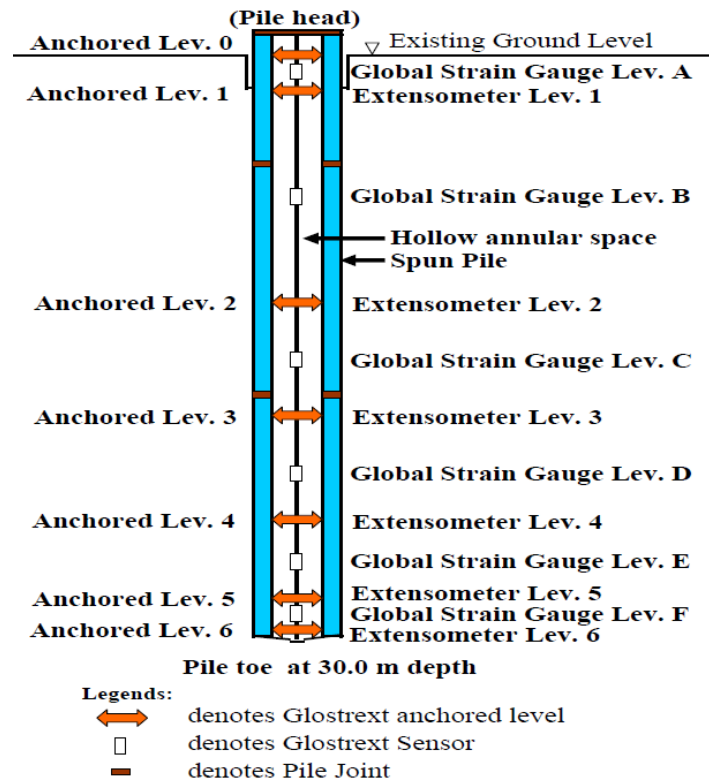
Schematic diagram of typical instrumented spun pile Global Strain Extensometer technology. (Ali and Lee,2008).
